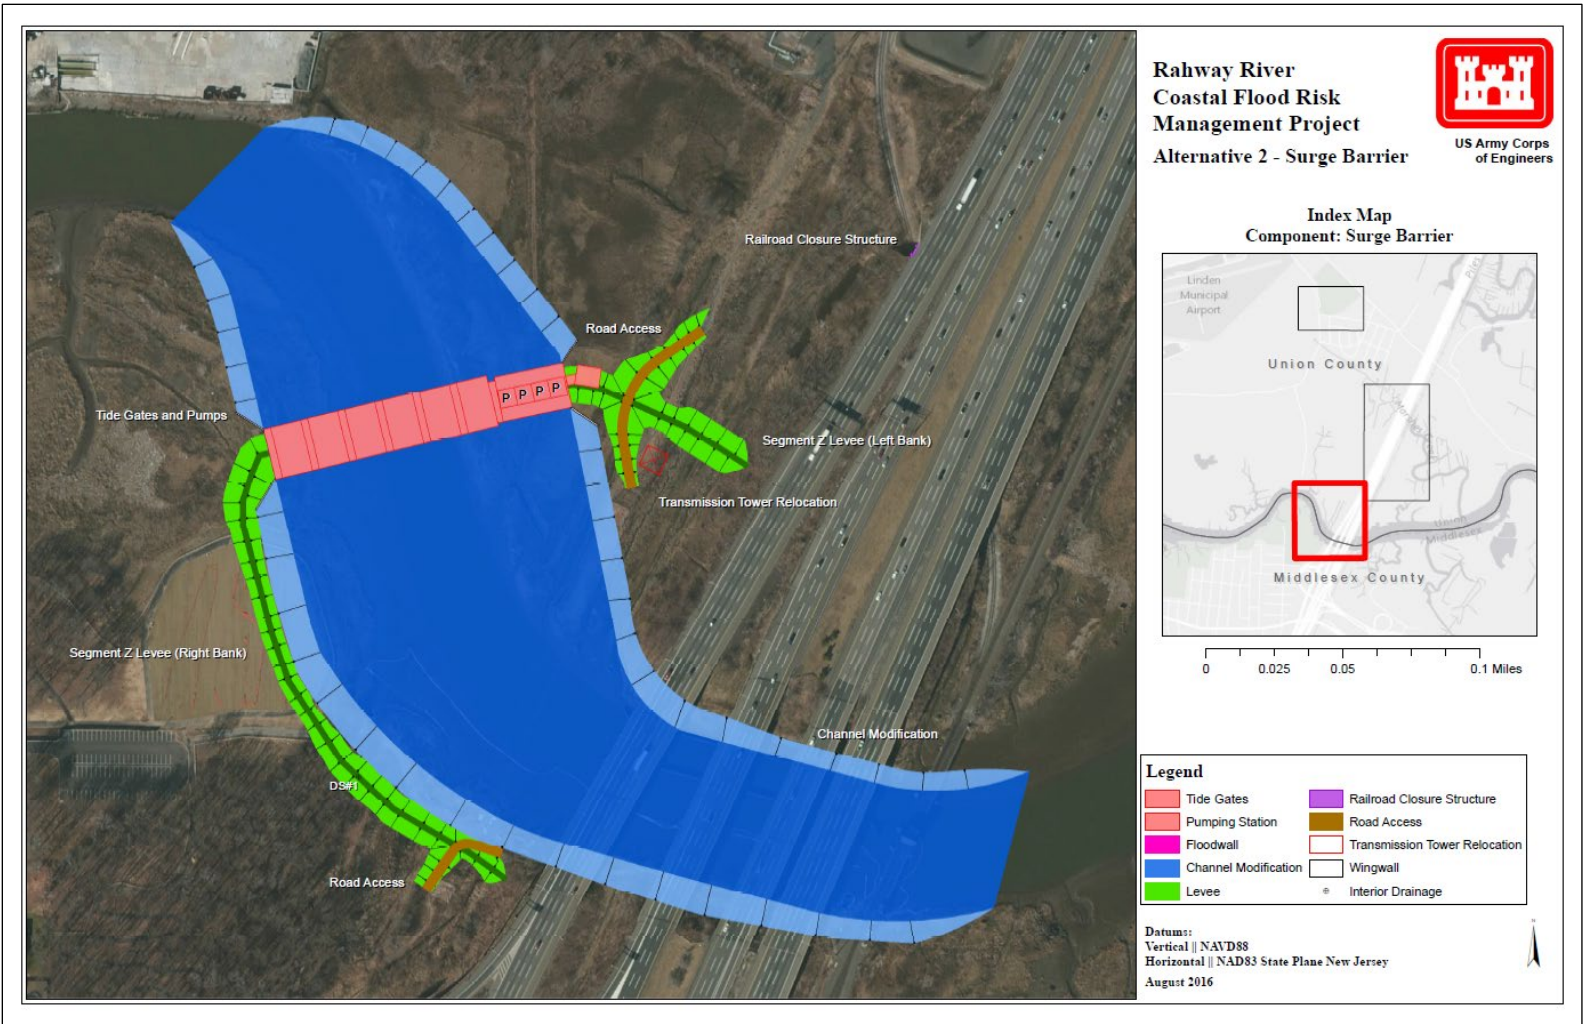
Alternative #2 Surge Barrier (Gates, Pumps, Levees, Channel Modification) layout.
